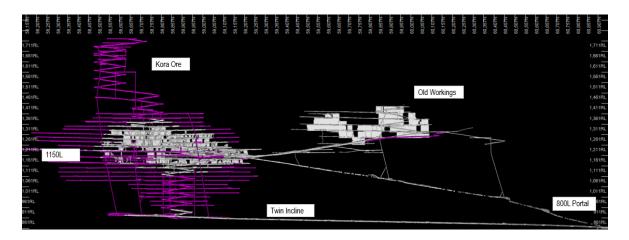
Long Section Showing Proposed Kora Underground Mine
